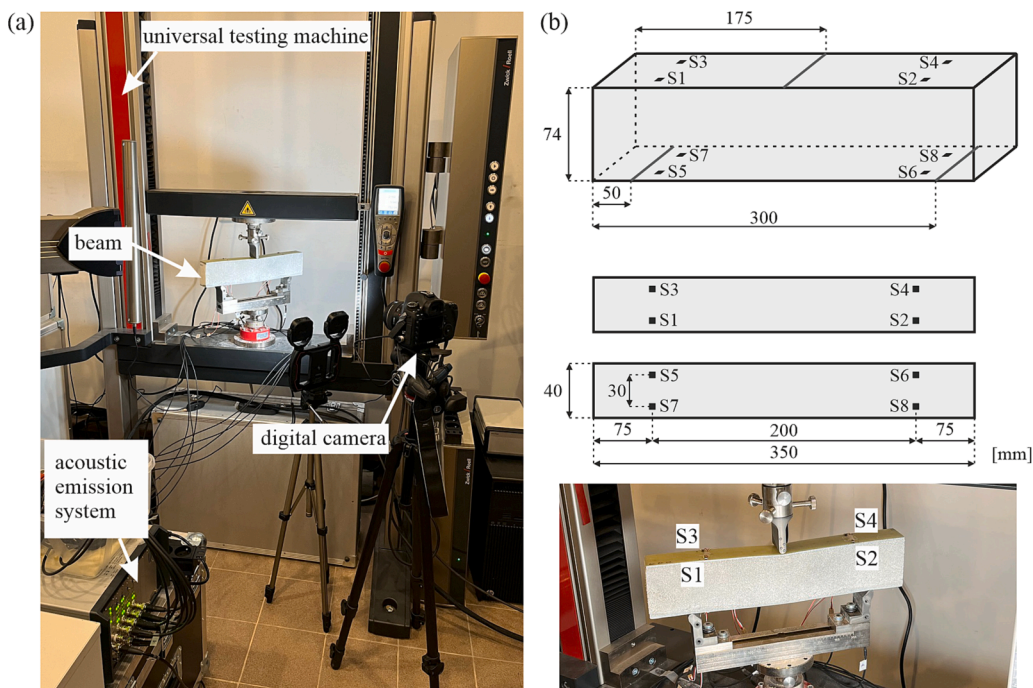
Experimental setup: (a) equipment setting, (b) scheme of PZT sensors location.
